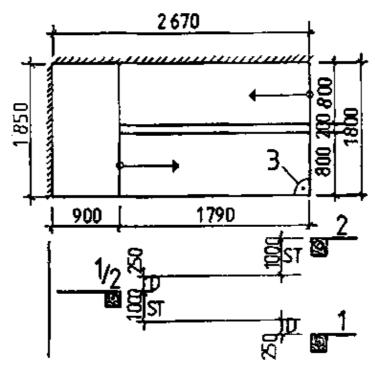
Hand–sketch with stairwell dimensions written into it – 1 lower stair–apron, 2 upper stair–apron, 3 determined right angle, – D difference size, St gauge size
